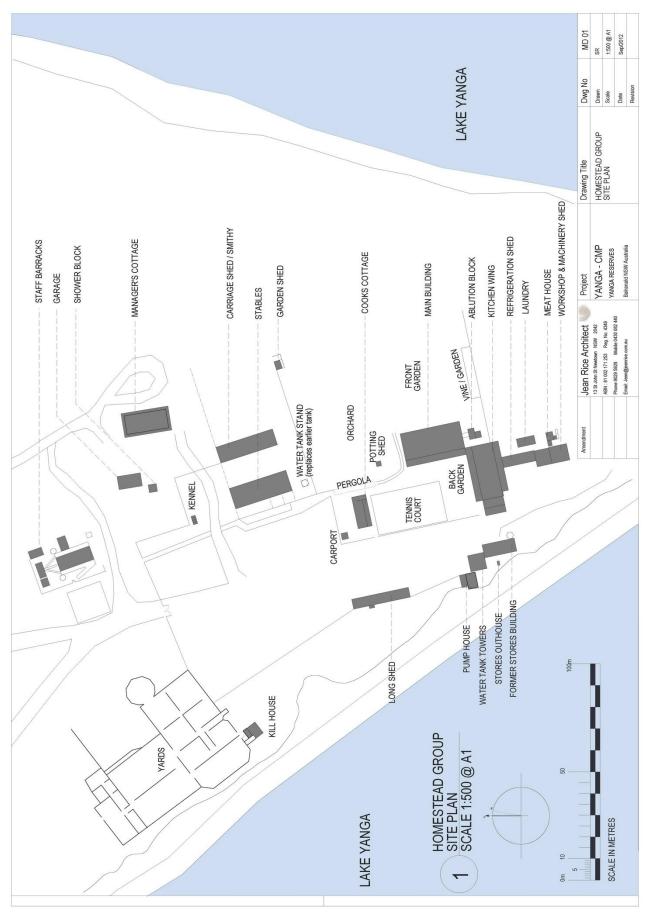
Homestead Group site plan. Jean Rice Architect, site assessment 2009.
